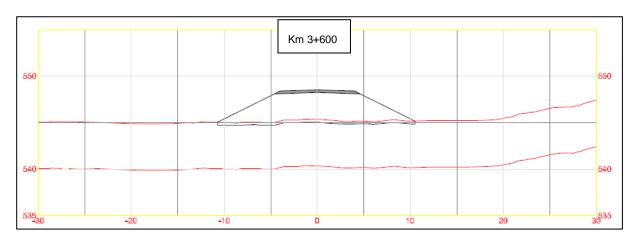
Example of Proposed Road Section that was not Flagged for Field Review
